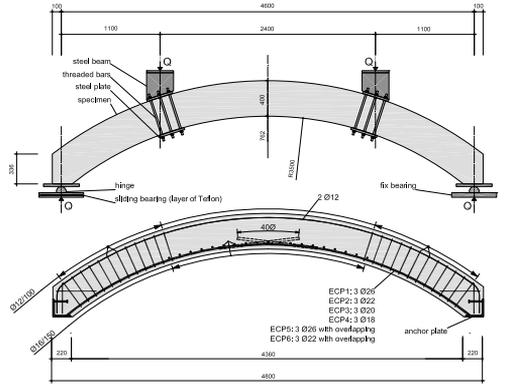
Geometry and reinforcement layout of the tested specimens (dimensions in [mm], rectangular cross-section 300 mm width).
